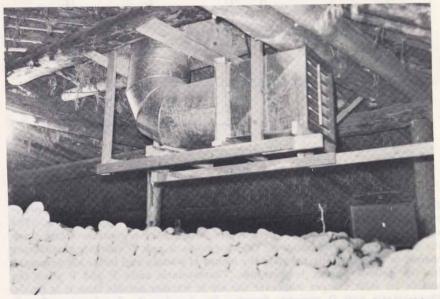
Exhaust fan unit placed in an air vent in the ceiling to blow warm air out.
